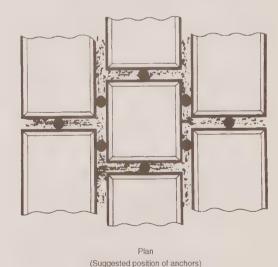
Using Epoxy Anchors to Secure Loose Unit Masonry
